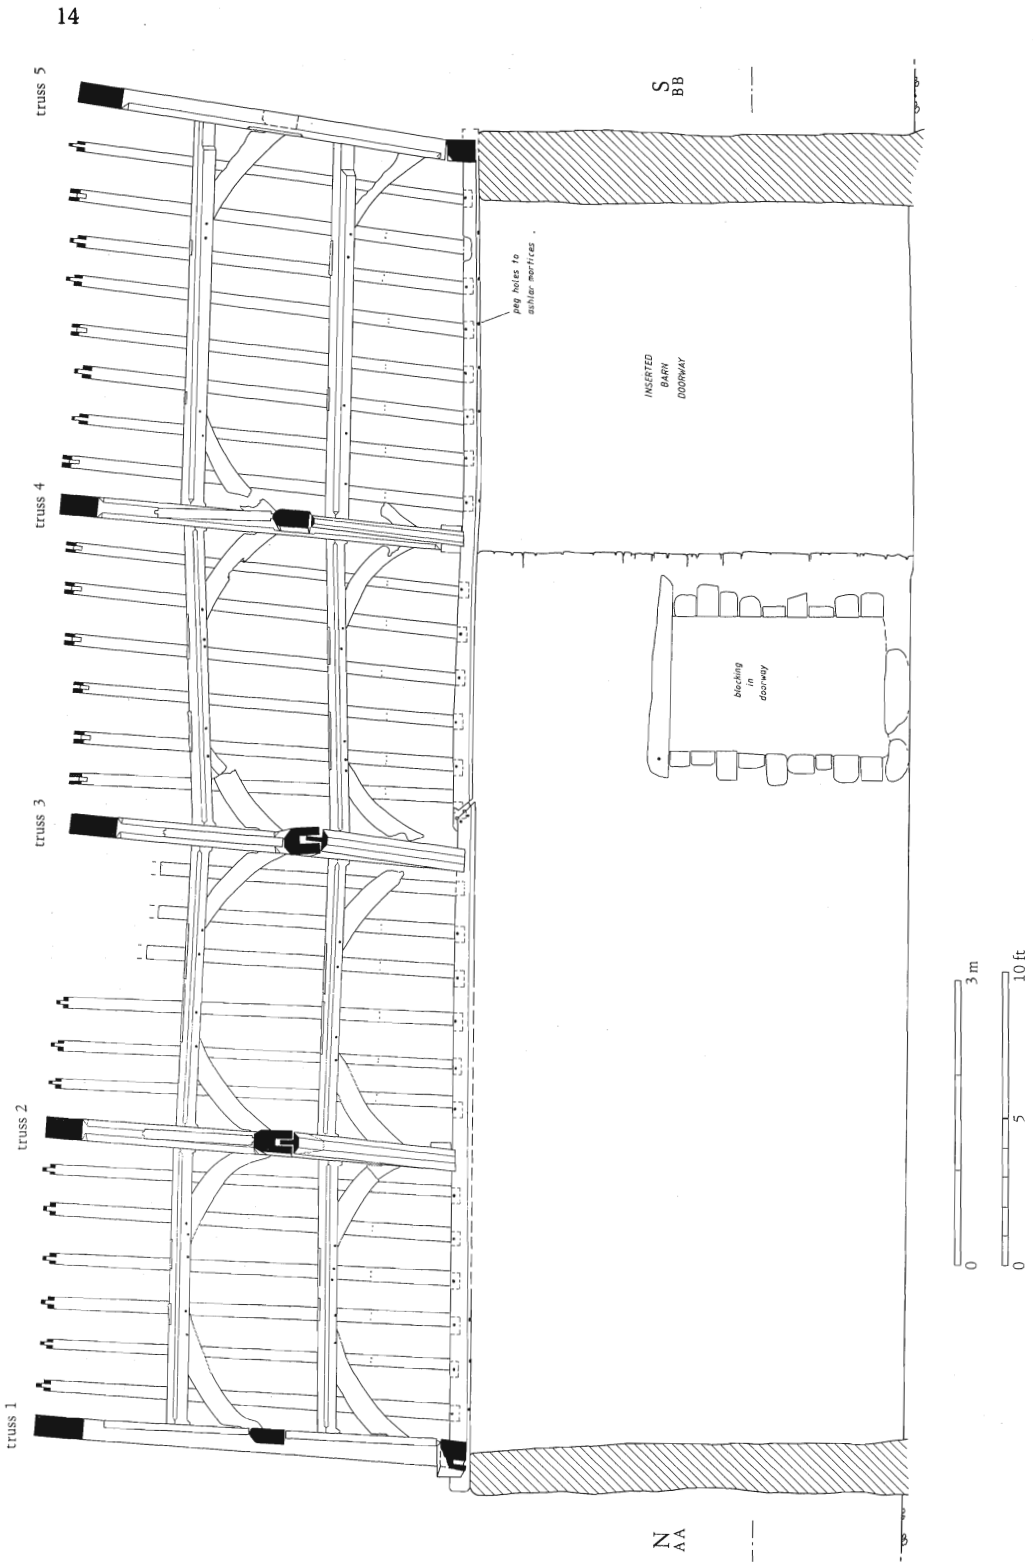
Ulverscroft Priory Guest Hall: Longitudinal section and east (internal) elevation
